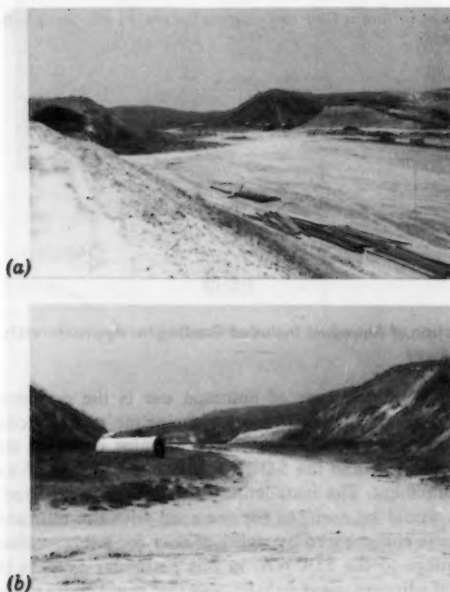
Highway-Type Cut Section for Proposed Regional Shopping Center
